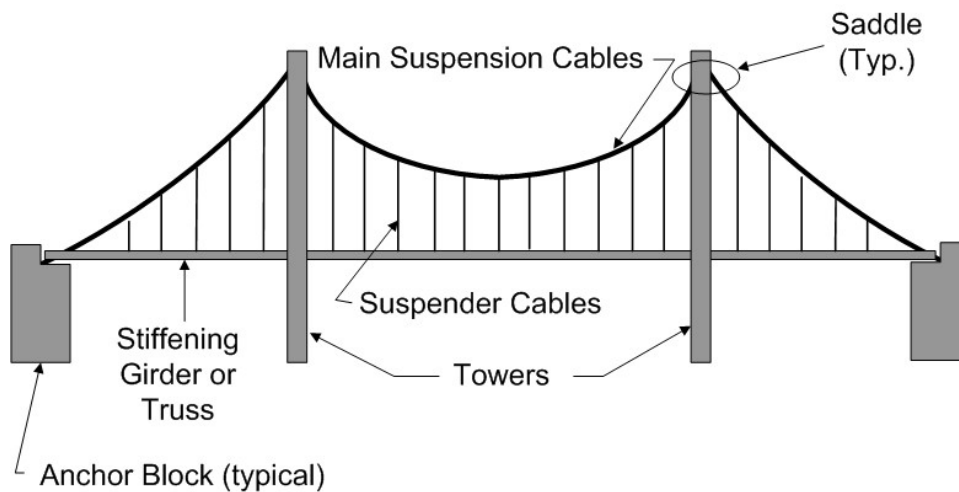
Three-Span Suspension Bridge Schematic
